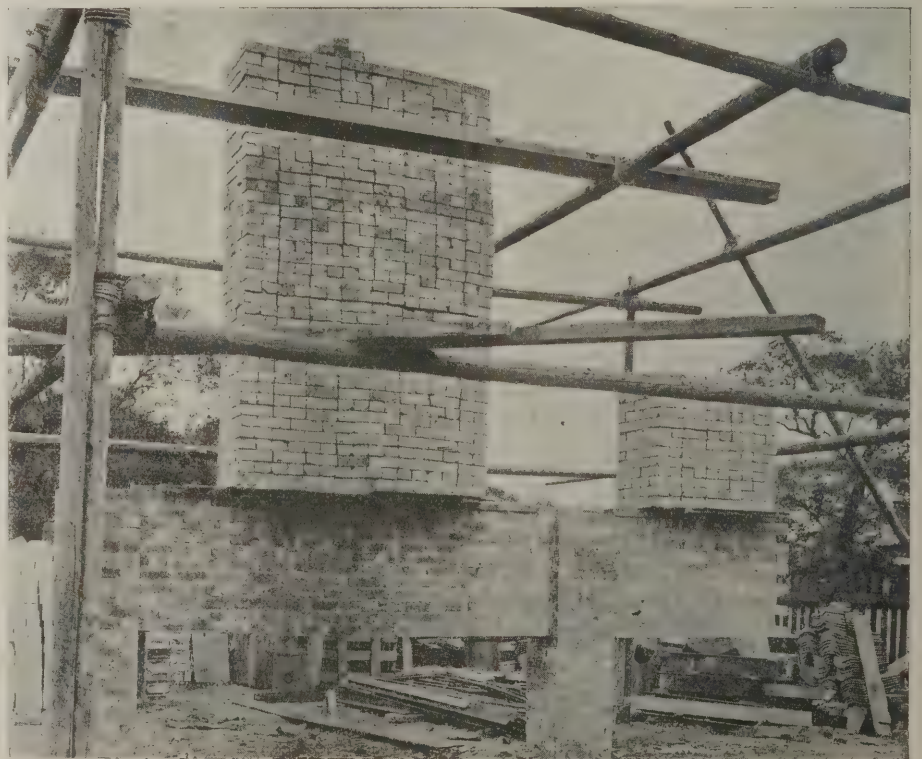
TESTS ON HOLLOW BRICK WALLS REINFORCED WITH WIRE MESHWORK.
